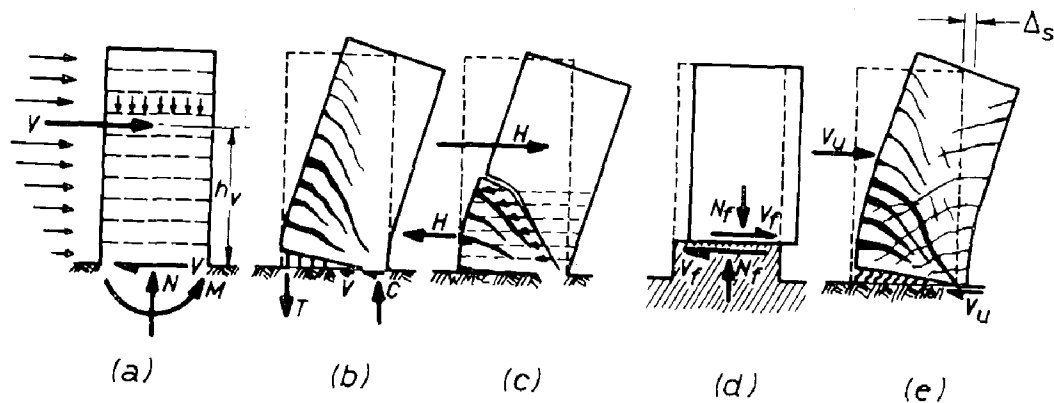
Failure modes in a laterally loaded reinforced concrete cantilever shear wall
